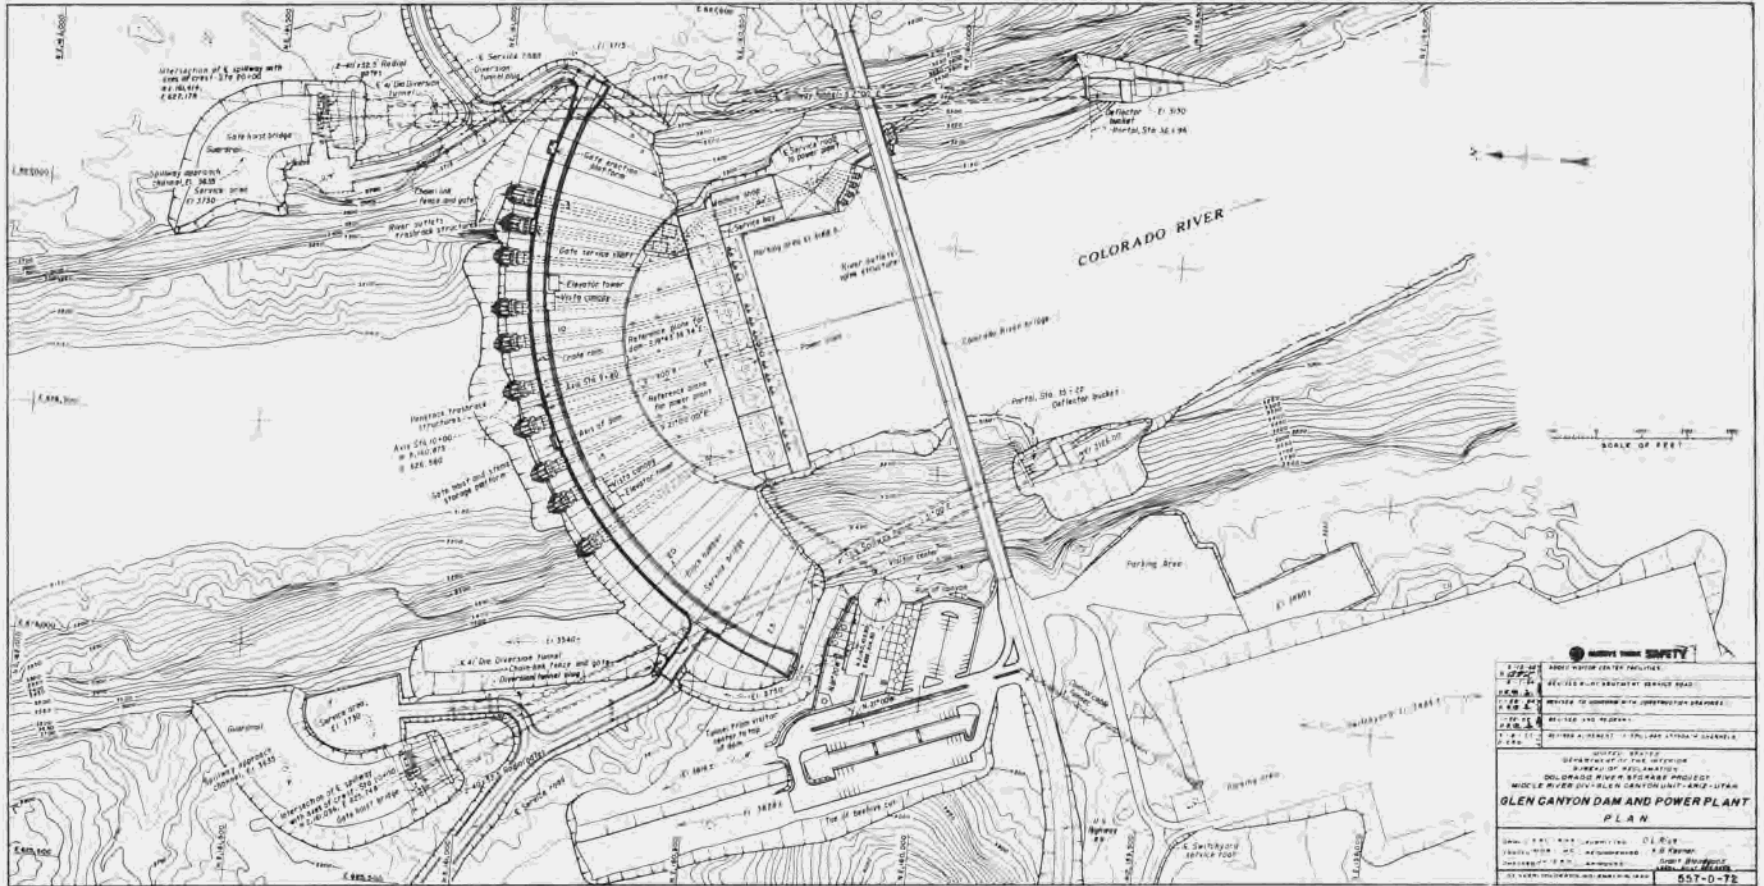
Glen Canyon Dam and Powerplant—Plan.
